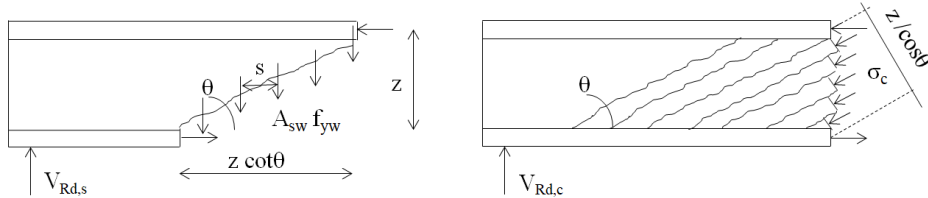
Variable angle truss model with stirrups, longitudinal reinforcement and an inclined compression field [24]
